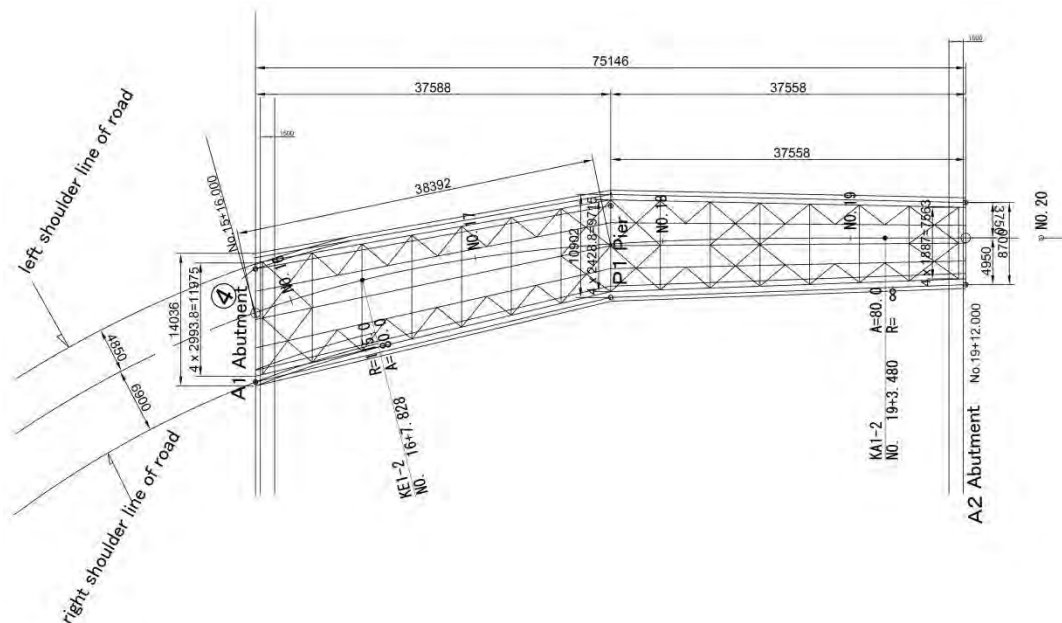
Main Girder Arrangement on Aum Bridge (1)
